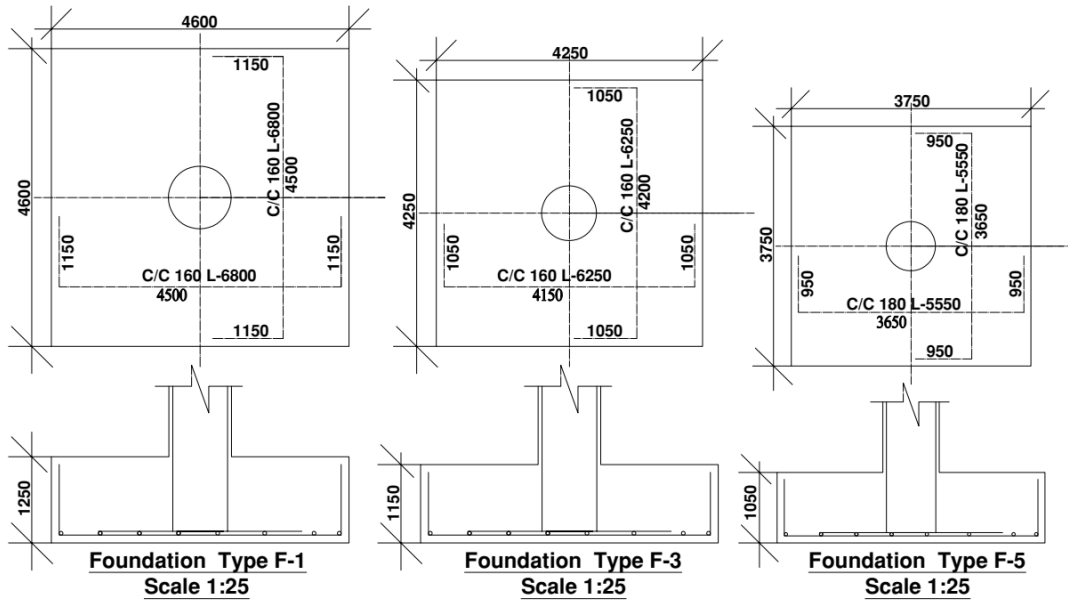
Sample foundation detailing for G+12 building with C-25 concrete
